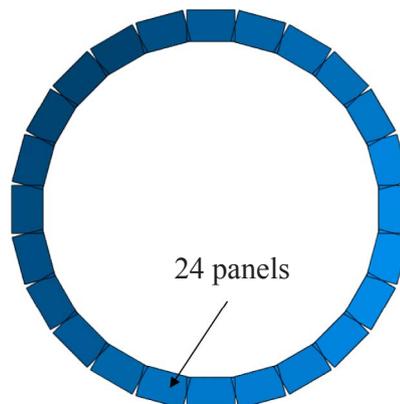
Plan view of the diaphragm wall with 24 panels.
